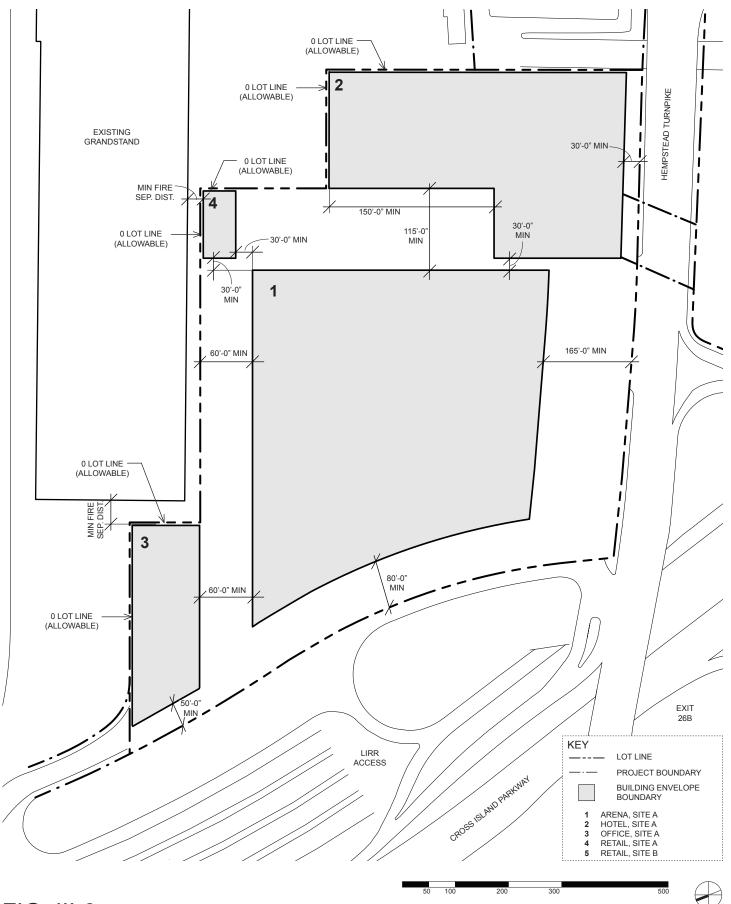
BUILDING ENVELOPE BOUNDARIES - SITE A
